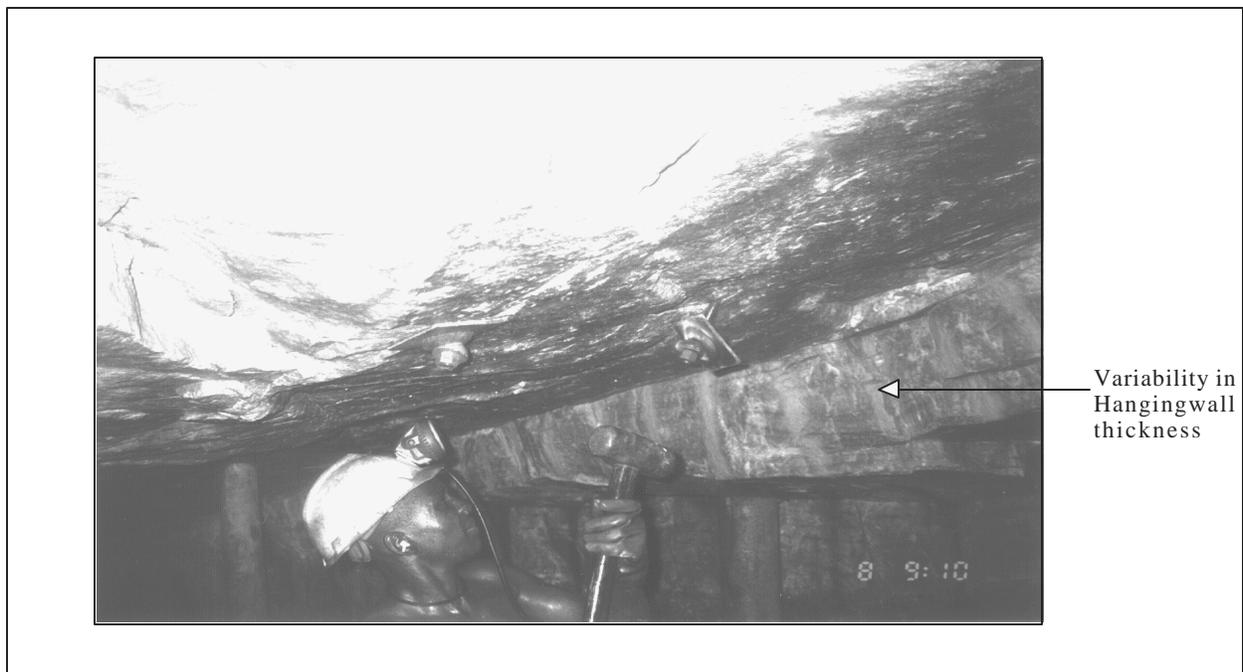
Variability in hangingwall beam thickness (Kinross Mine). A worker pushing a rockbolt into a hole, prior to tensioning, at a stope face.
